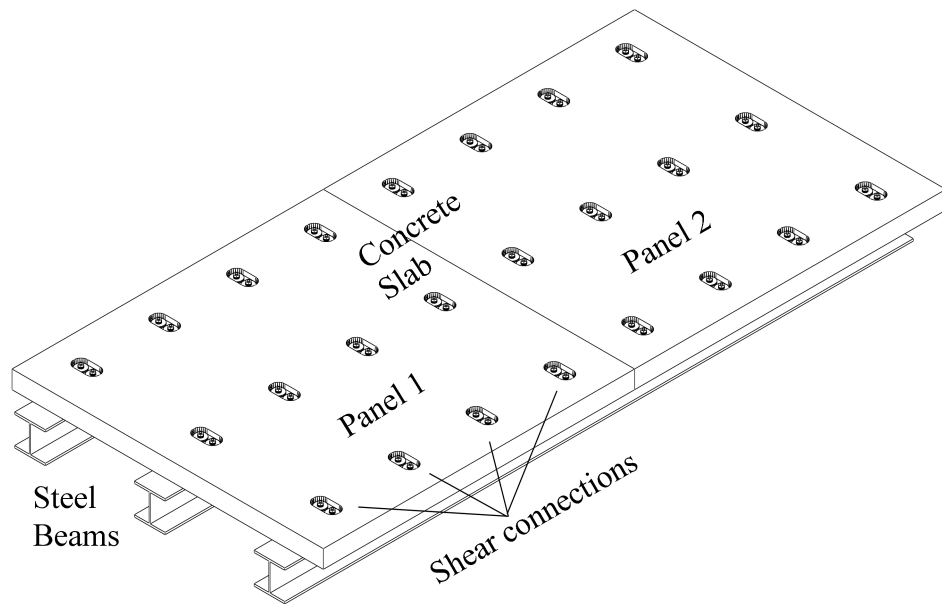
Precast steel-concrete composite bridge using the novel shear connector
